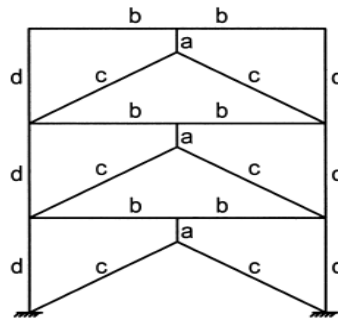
Vertical link beam. a :link , b: beam segment outside of link, c:brace, d: column.
